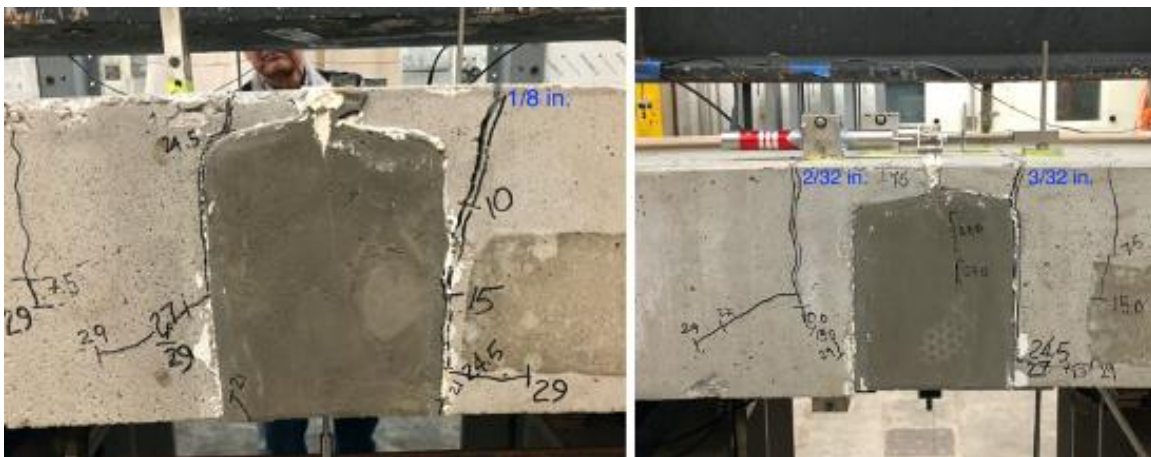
Photo. Horizontal cracks on north side at 27 kip load.
